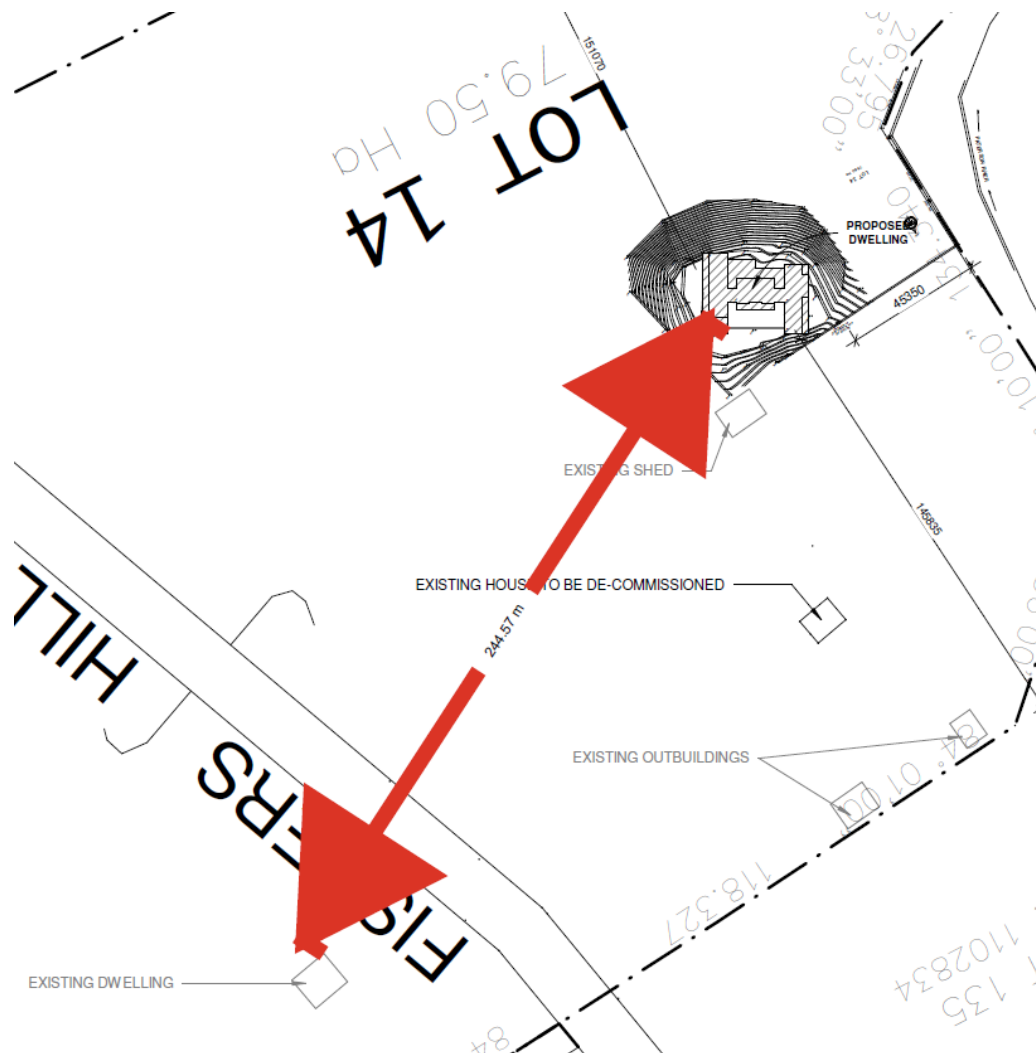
Proposed site plan, showing existing and proposed dwelling (source: Agcad, 2026)
